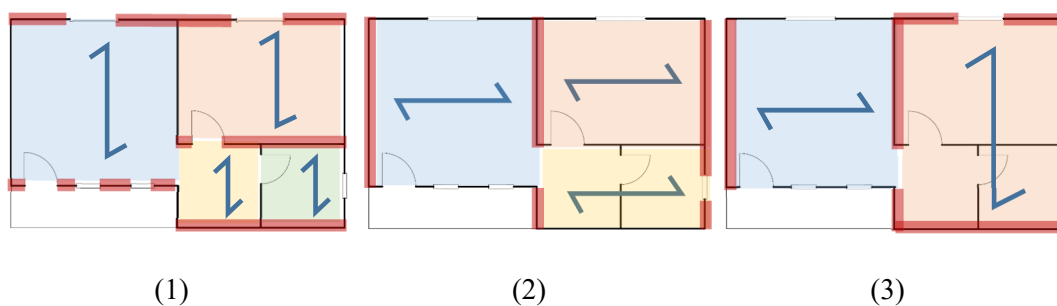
The possible approaches for defining the structural/spanning zones in a small 3DP cob house with indication for spanning direction. (1) Alternative with four structural zones; (2) Alternative with three structural zones; (3) Alternative with two structural zones. The load-bearing walls are highlighted in red.
